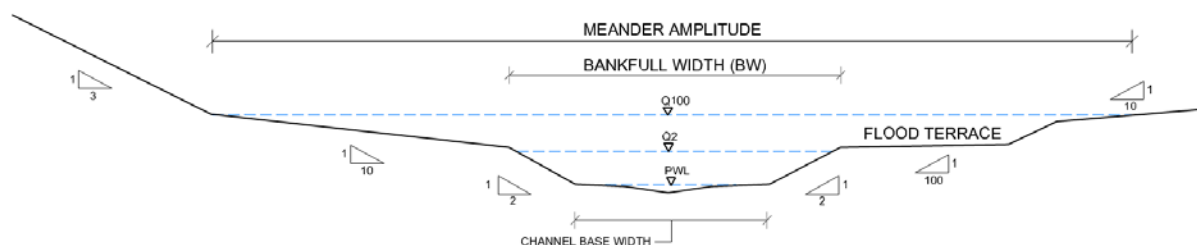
Typical section of the Roslyn Stream realignment in terms of flooding profiles
